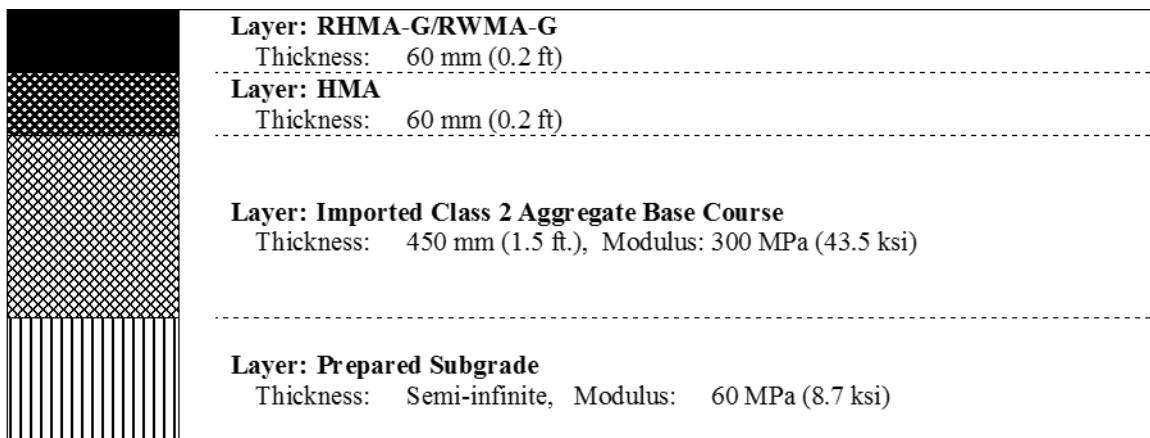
Illustration. Original pavement structure for rubberized warm-mix asphalt test sections.
